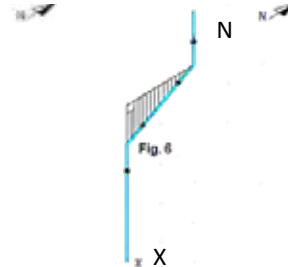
Isometric view of piping with rolling and running to east
